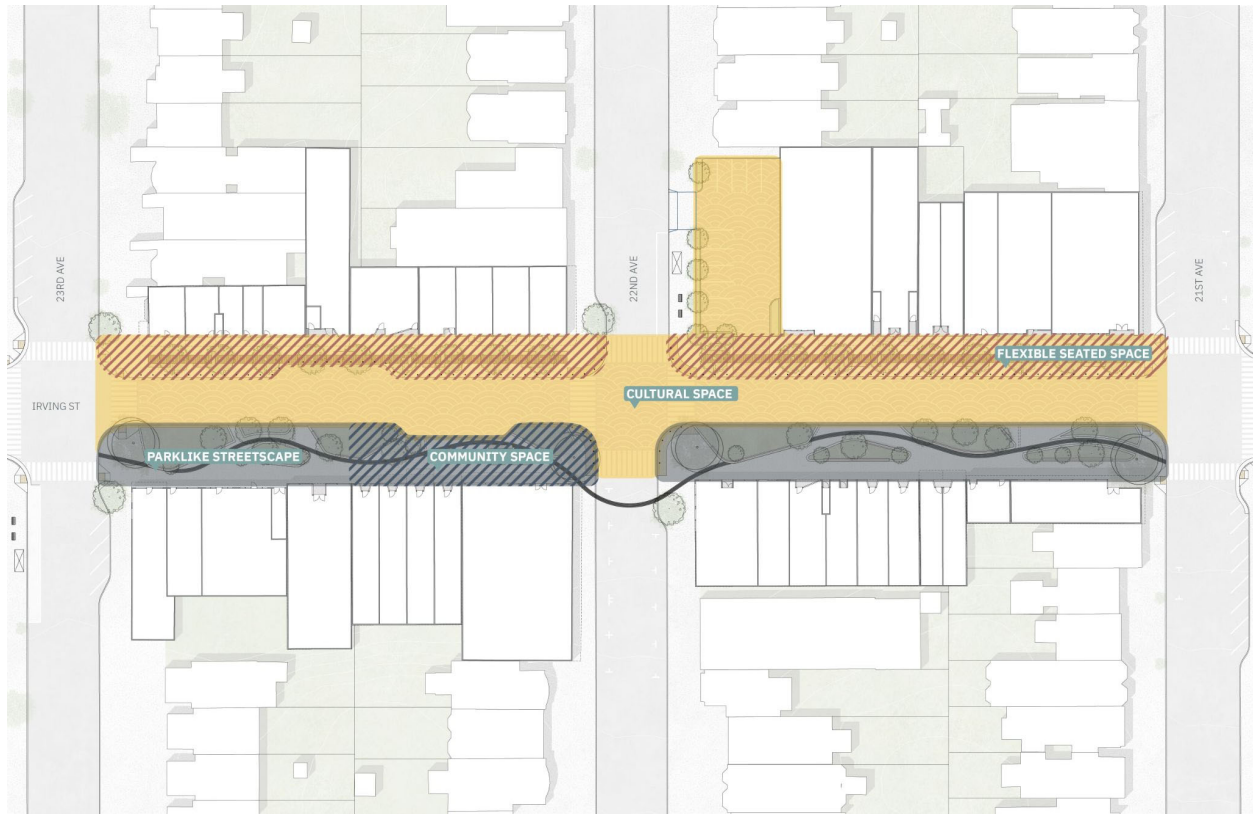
Proposed site plan illustrating social spaces to meet community needs
